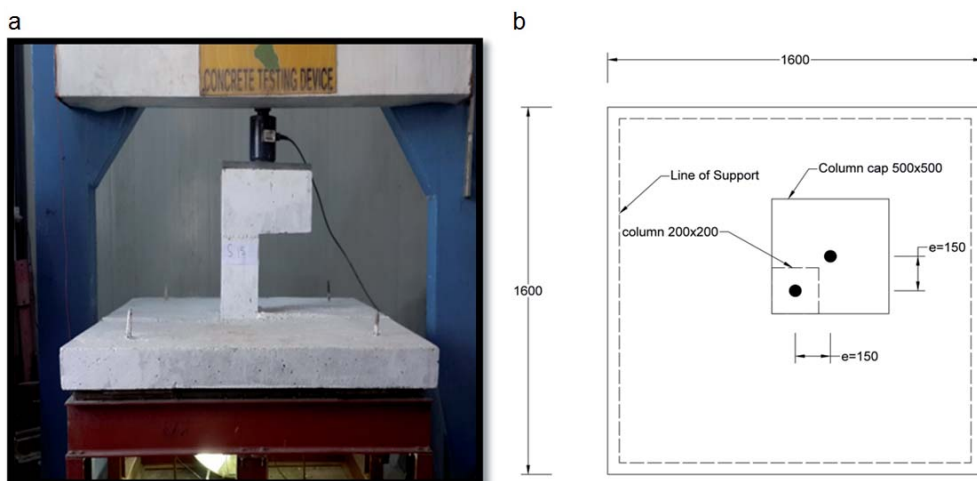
Test set-up under biaxial load: a – test set-up; b – top view sketch (all dimensions in mm)
